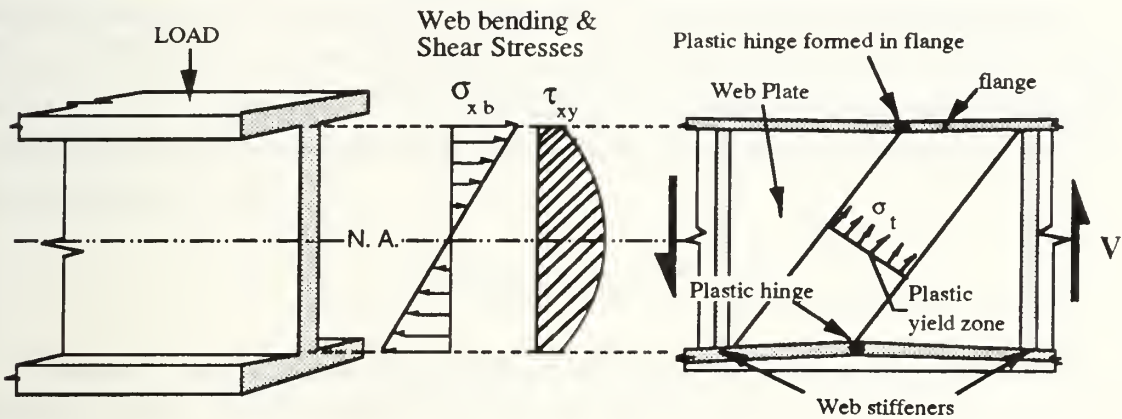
Failure Model for Symmetrical Girder Loaded in Shear
